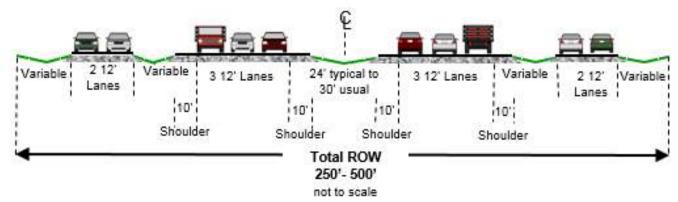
shows a typical cross section for a Controlled Access Facility with six lanes. The figure shows a grassy center median with a typical 24' to 30' width, and smaller median areas buffering between the main lanes and the frontage roads. Safety treatments in the medians or road margins such as guardrails and cable barriers are common to prevent vehicle cross-overs, but are not shown in the illustration.
